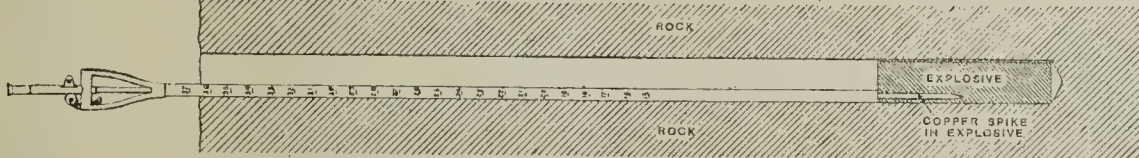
SHOT-HOLE RAMMED TO WITHIN 4 INCHES OF MOUTH, INTERNAL ROD AND SPIKE WITHDRAWN, LEAVING CLEAR PASSAGE THROUGH HOLLOW TUBE INTO EXPLOSIVE.
